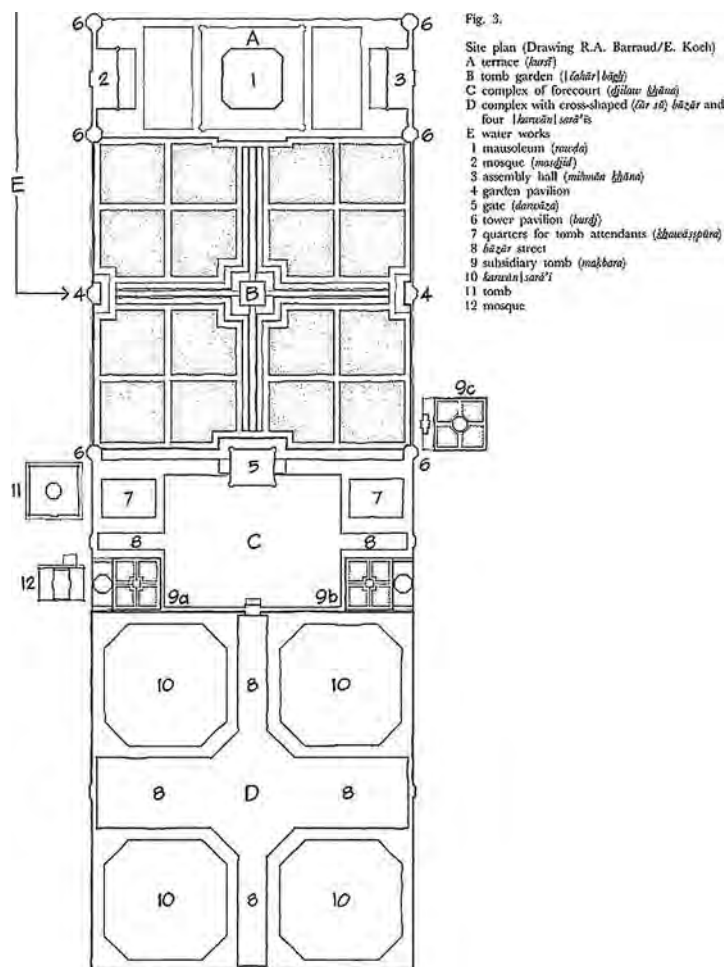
Site plan (Drawing R.A. Barraud/E. Koch).
